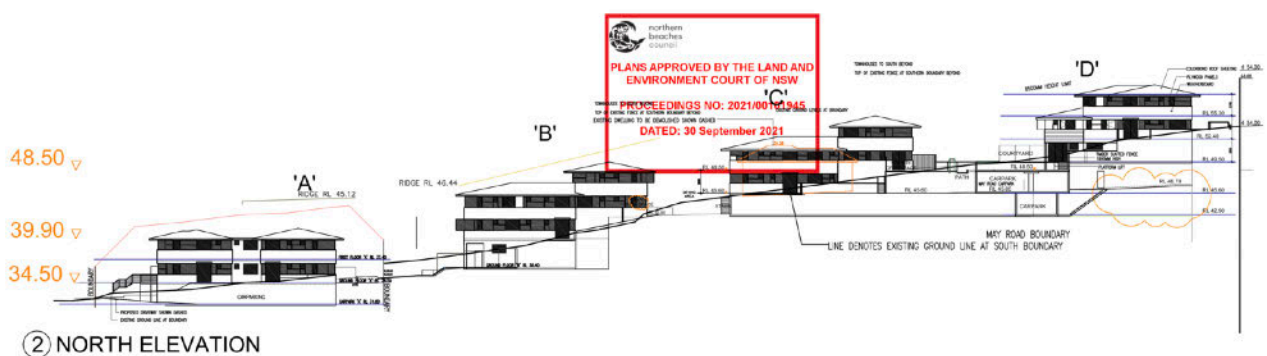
North Elevation approved under Mod 2021/0226 and consistent with the original approval demonstrating two storey presentation to No. 3 May Road
